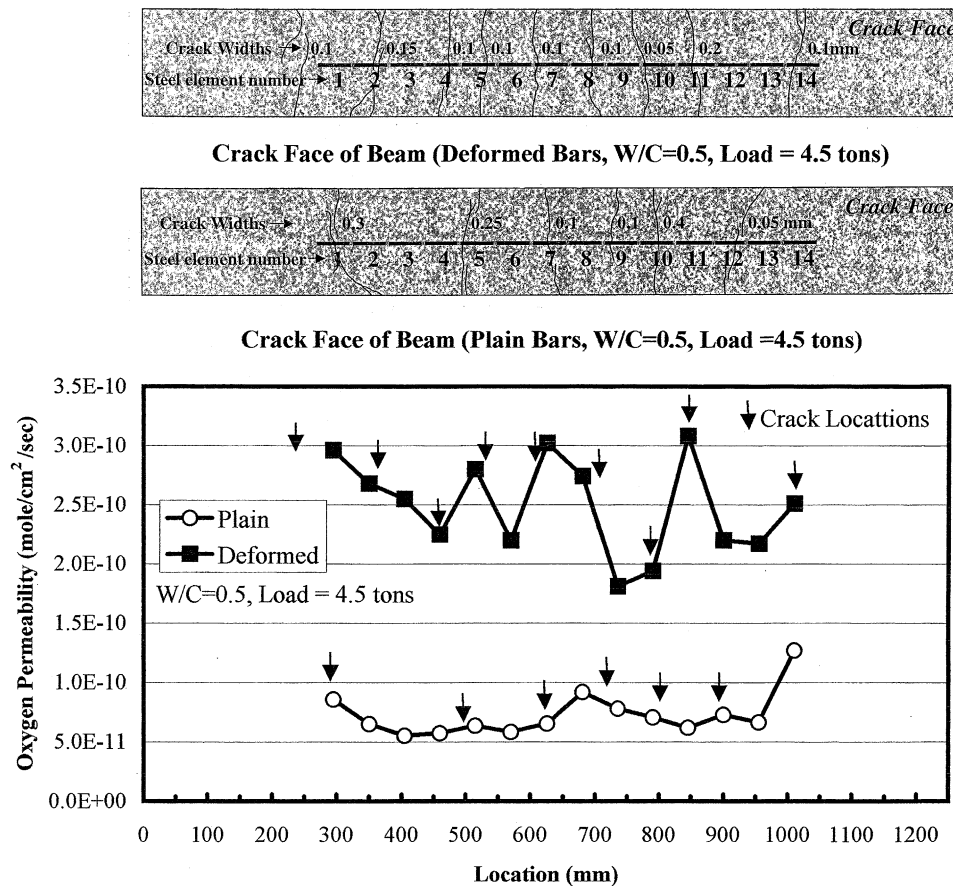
Crack maps and oxygen permeability of beams with plain and deformed bars.
